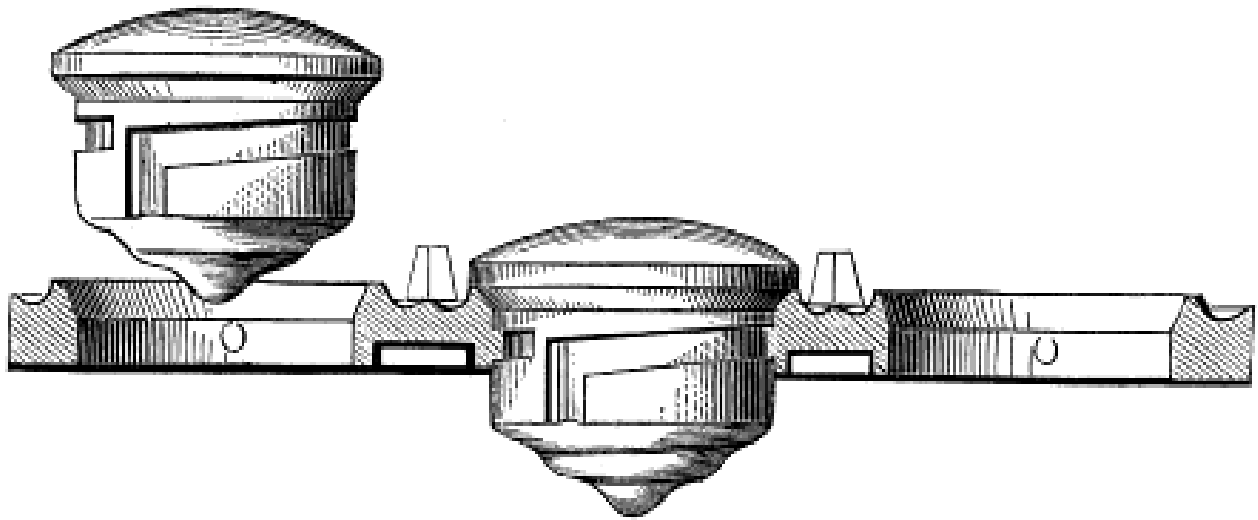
Sectional View of the Manner of Connecting the Glass.
